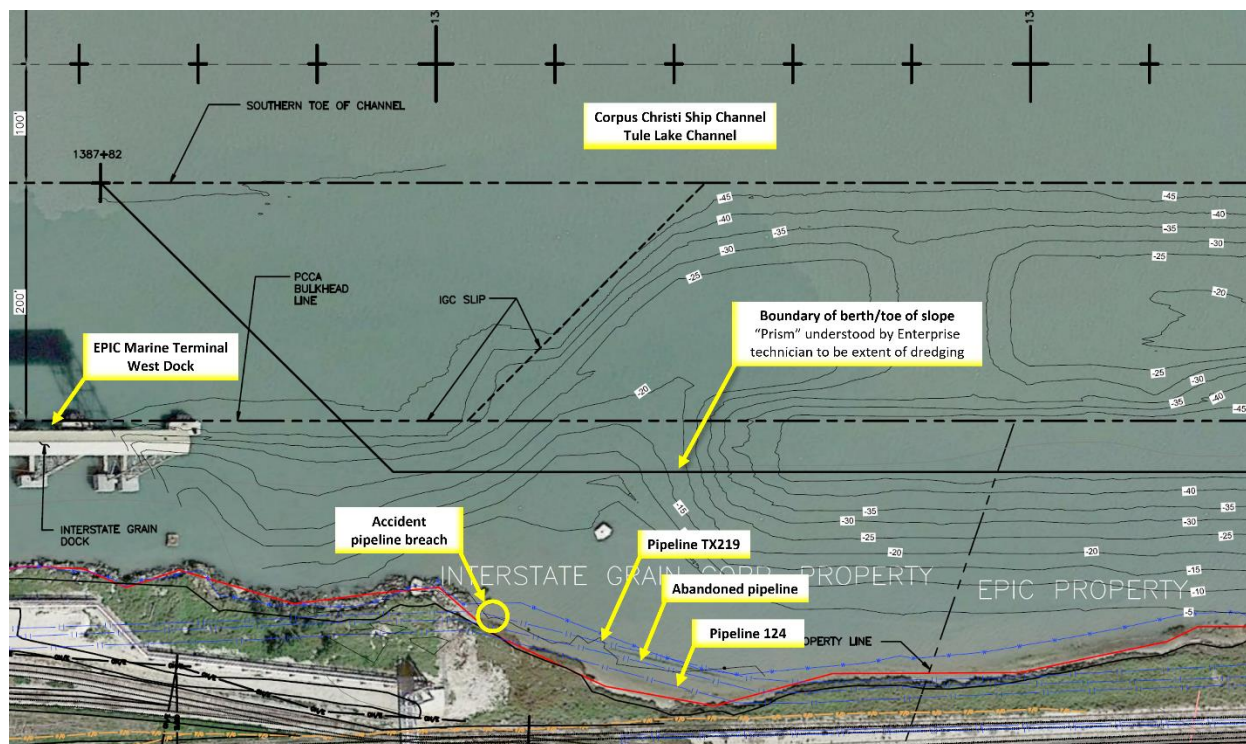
Annotated excerpt from the “Existing Site Plan,” drawing no. G2.1, in the Schneider Engineering EPIC Marine Terminal dredging construction plan. (Source: Orion Marine Group, annotated by NTSB)
